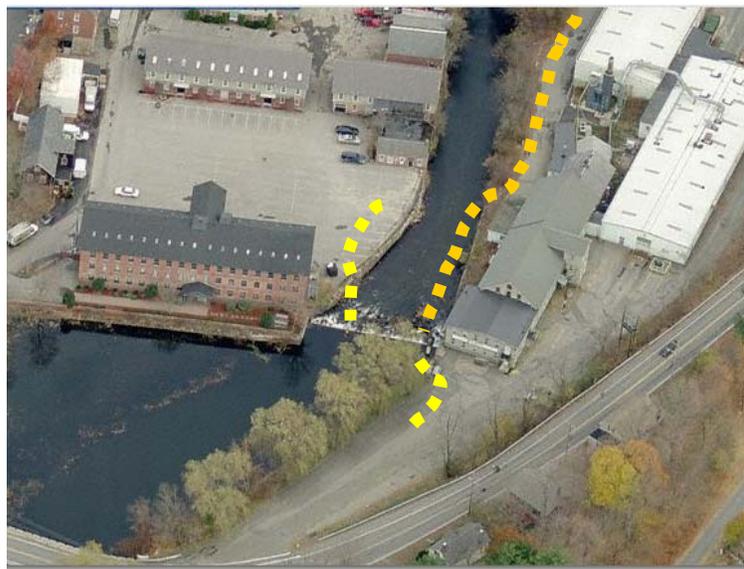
Primary (orange) and secondary (yellow) access routes for construction at the Ballardvale Dam site
